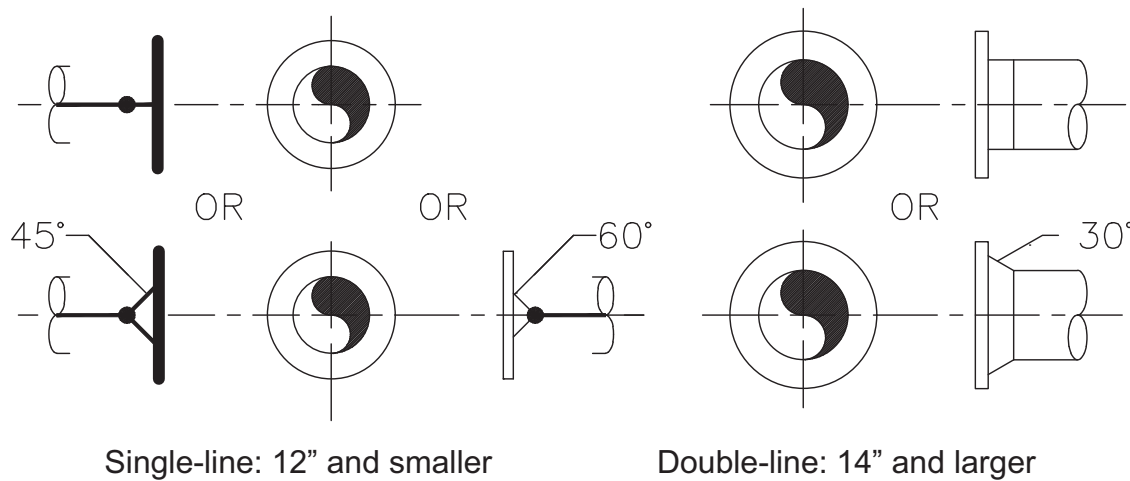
Weld neck flange drawing symbols.
